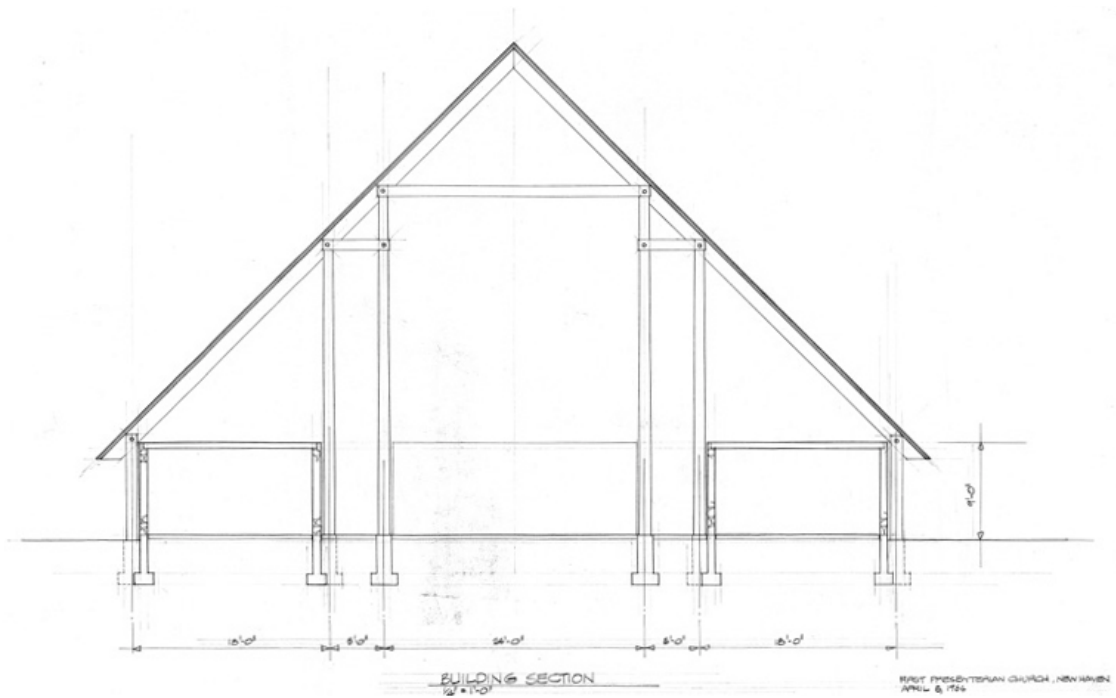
Design section for scheme with single pitch gable roof, 1966, Jim Owens and John Dinkeloo.
